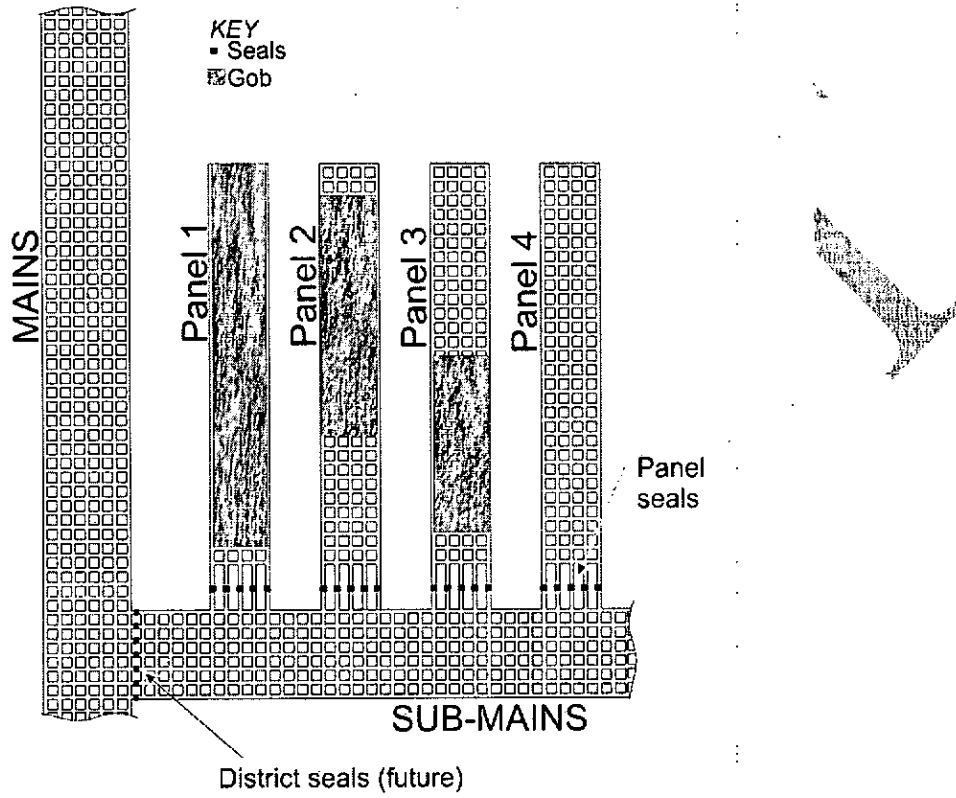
B – Typical layout of room-and-pillar mine using bleederless ventilation system. Also shown are typical locations for district and panel seals.
